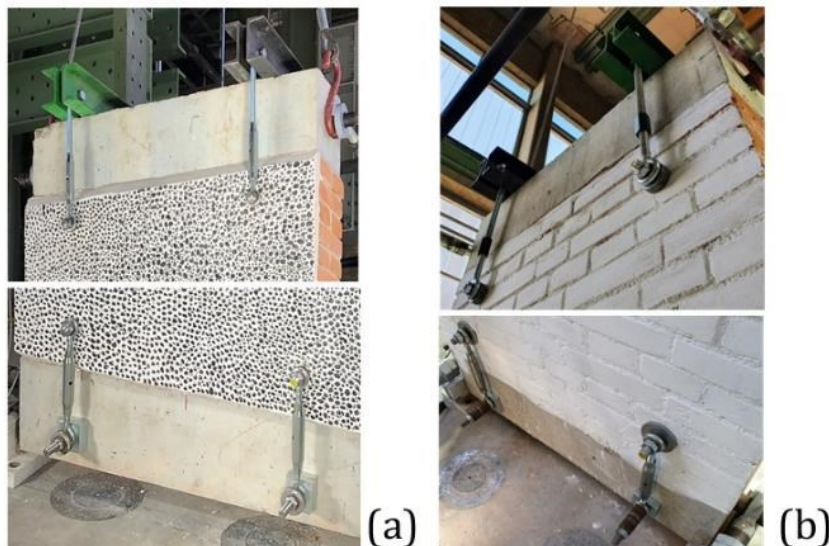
Steel tie rods at the top and bottom of brick masonry pier. Strengthened side (a) and unreinforced side (b)
